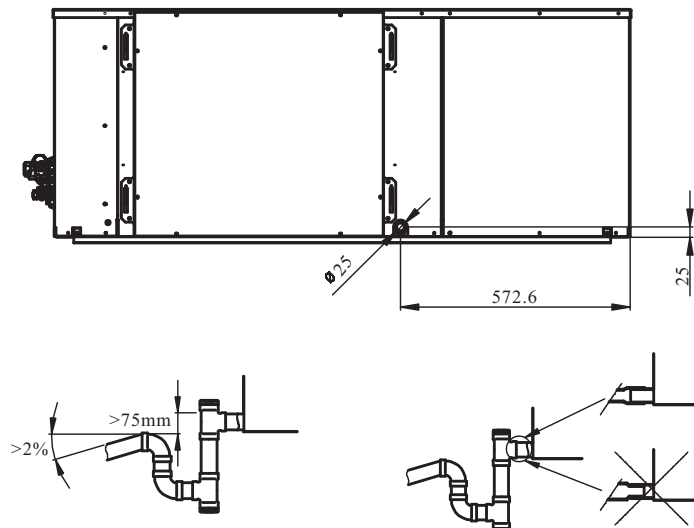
Schematic diagram for connecting pipe of outdoor unit
